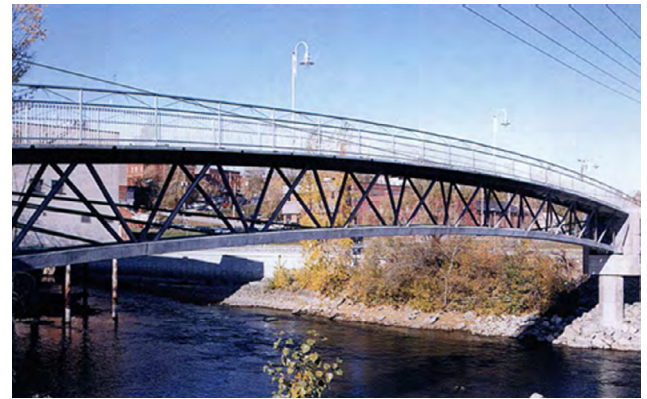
Canada Sherbrooke Overpass. (source: Blaise, P.Y. and Couture, M. Precast, "Prestressed Pedestrian Bridge-World's First Reactive Powder Concrete Structure", 1999).
